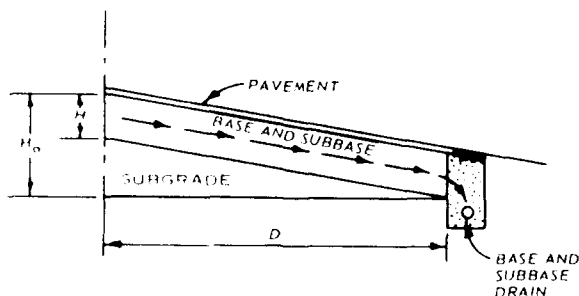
Pavement dimensions for base course drainage design (from U.S. Army 1979).
